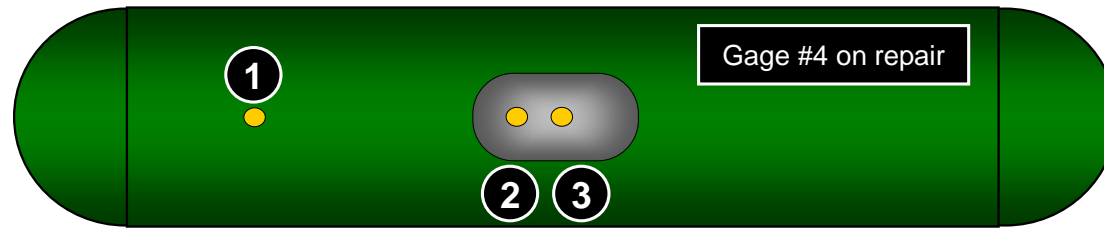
Details on machining corrosion in 12.75-inch x 0.375-inch, Grade X42 pipe
